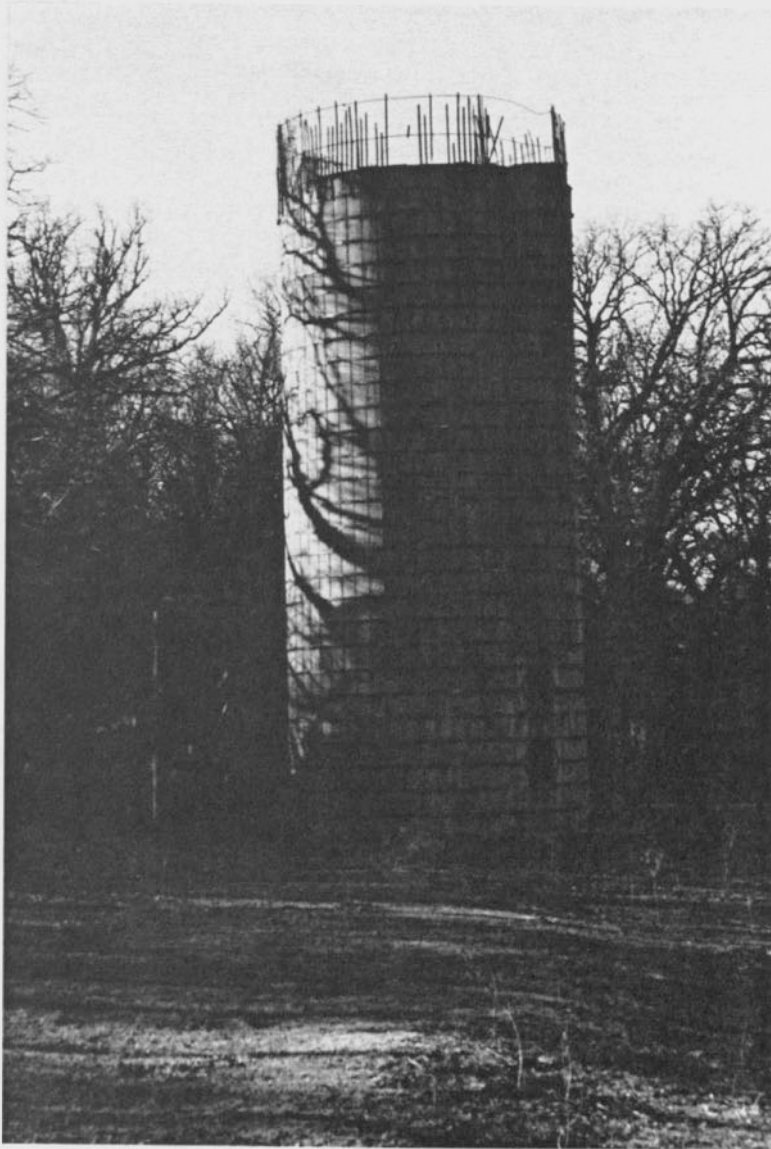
Example of concrete silo typical of the 1920s on Skyline Drive
